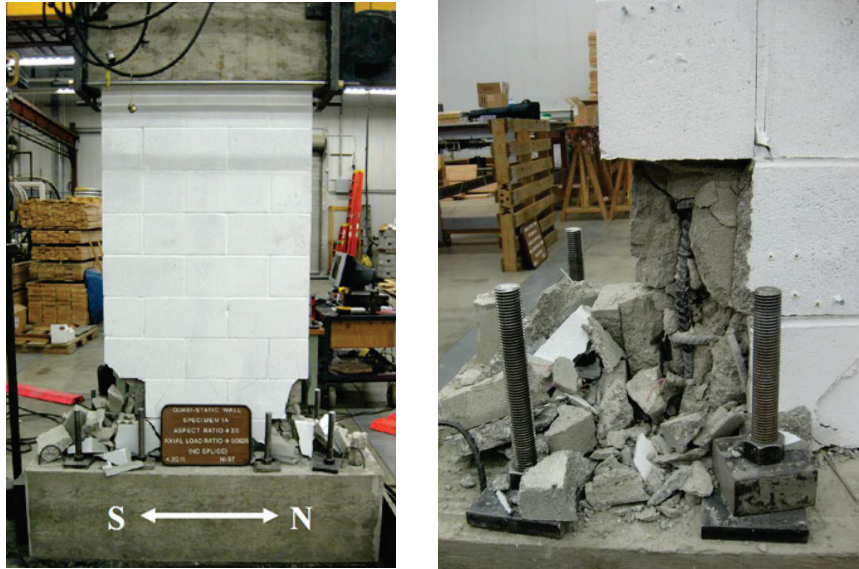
Crushing and bar buckling in a flexure-dominated wall (Wall WSU-W-1A tested by Sherman, 2011).
